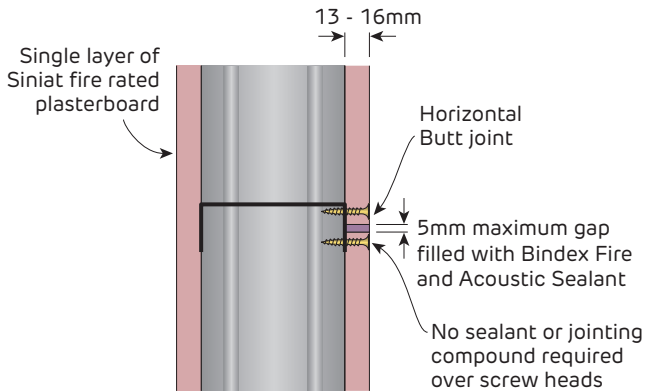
Horizontal Joints in Single Layer Wall Systems
